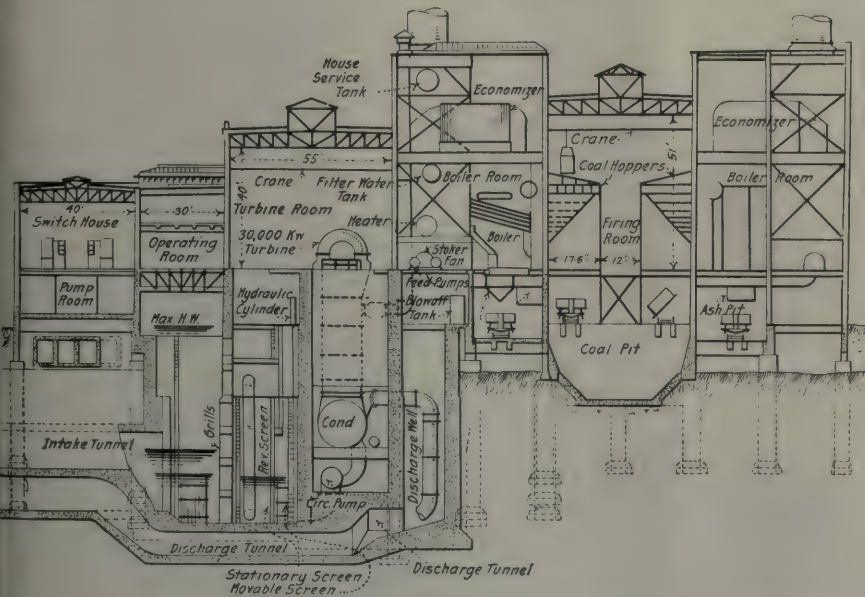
CROSS-SECTION THROUGH WINDSOR PLANT SHOWING COMPLETE ARRANGEMENT OF EQUIPMENT
